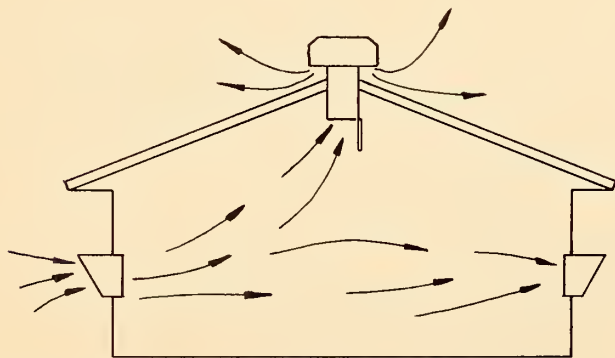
In summer, outdoor air is drawn through a fan into the laying house and is exhausted through adjustable ridge vents and sidewall openings (blow-in system). In winter, the fan is reversed and air is drawn through ridge vents and sidewall openings and exhausted through the fan (blow-out system).
